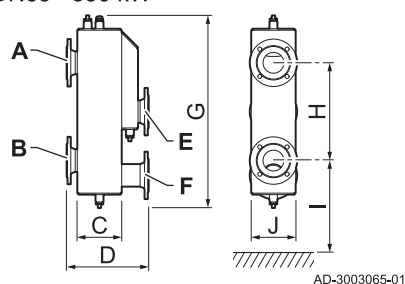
Low loss header dimensions - DN65 <350 kW - DN100
